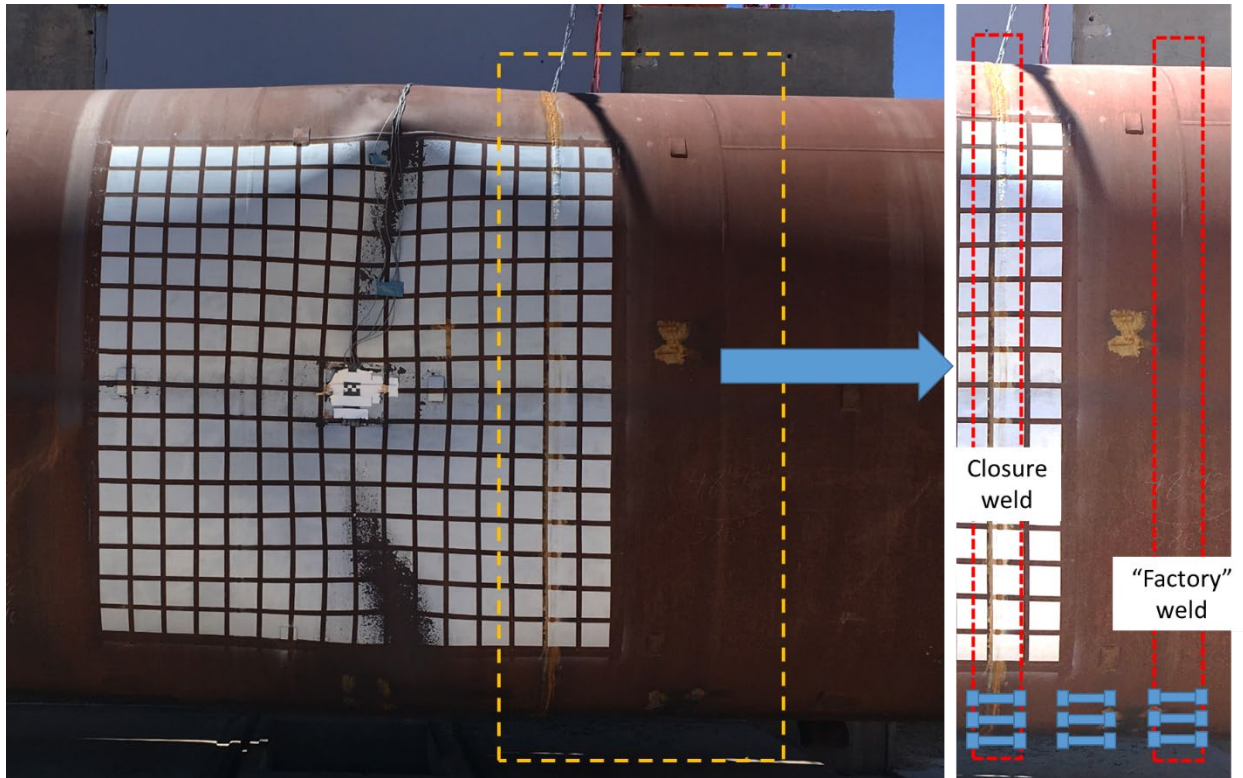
Longitudinal Positions of Closure and Factory Welds for Tensile Testing
